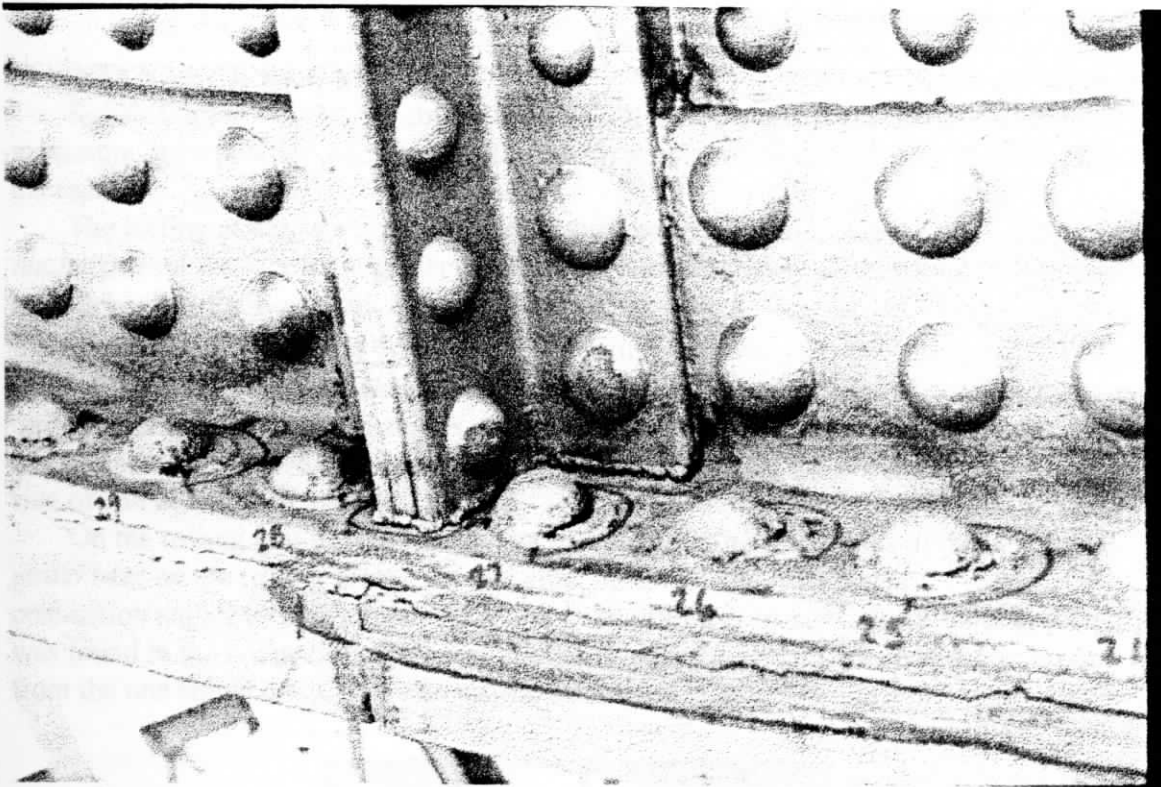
Large crack running along rivet line in segmental plate attachment.
